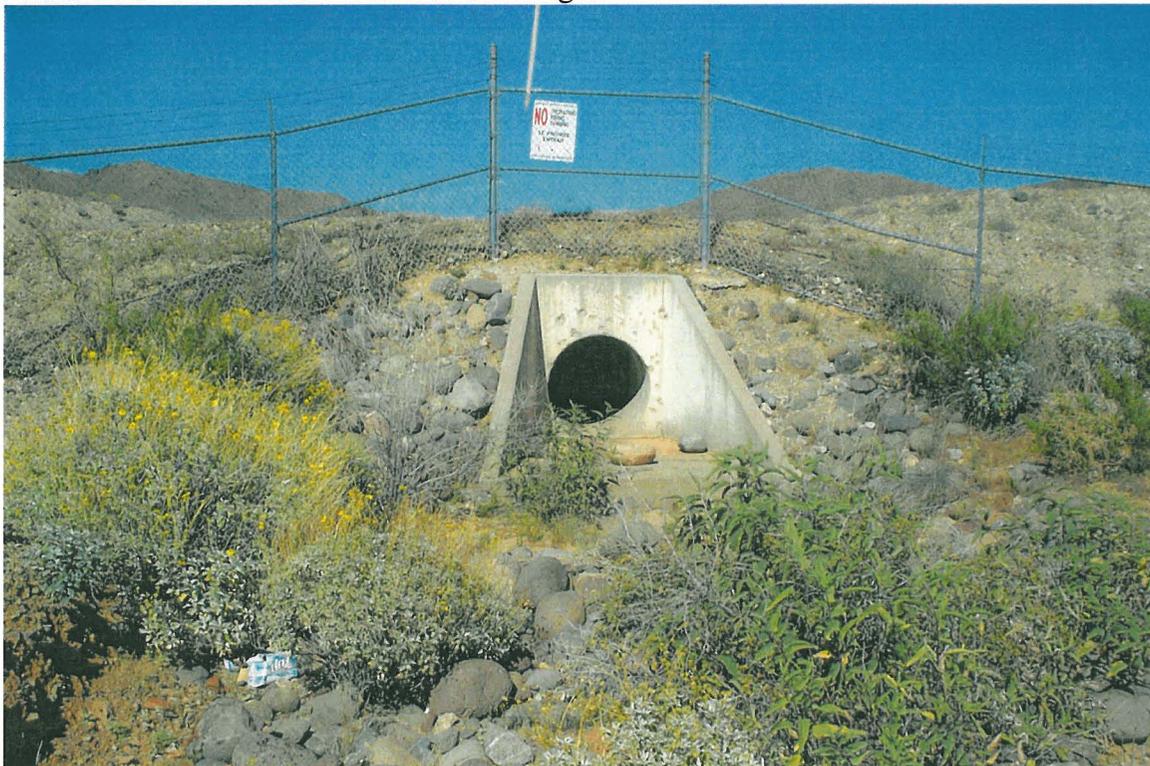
Photo C: Main Channel and Overbanks Upstream of Crossing #3
